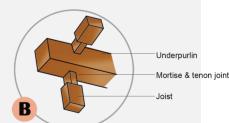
Detail Construction for Layar Linggi Sculpture
